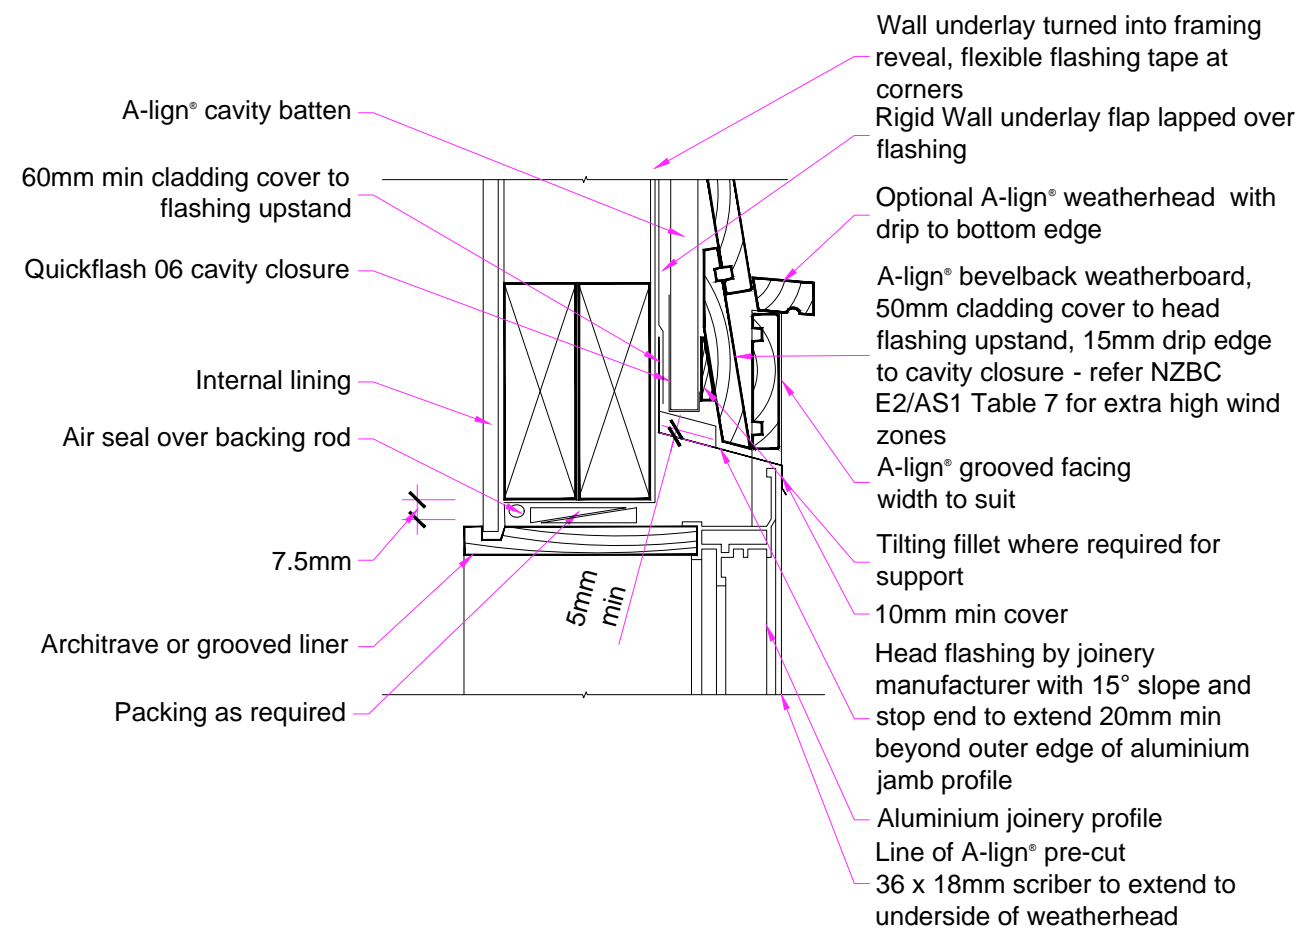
A-lign® bevelback weatherboard - cavity - aluminium window head
